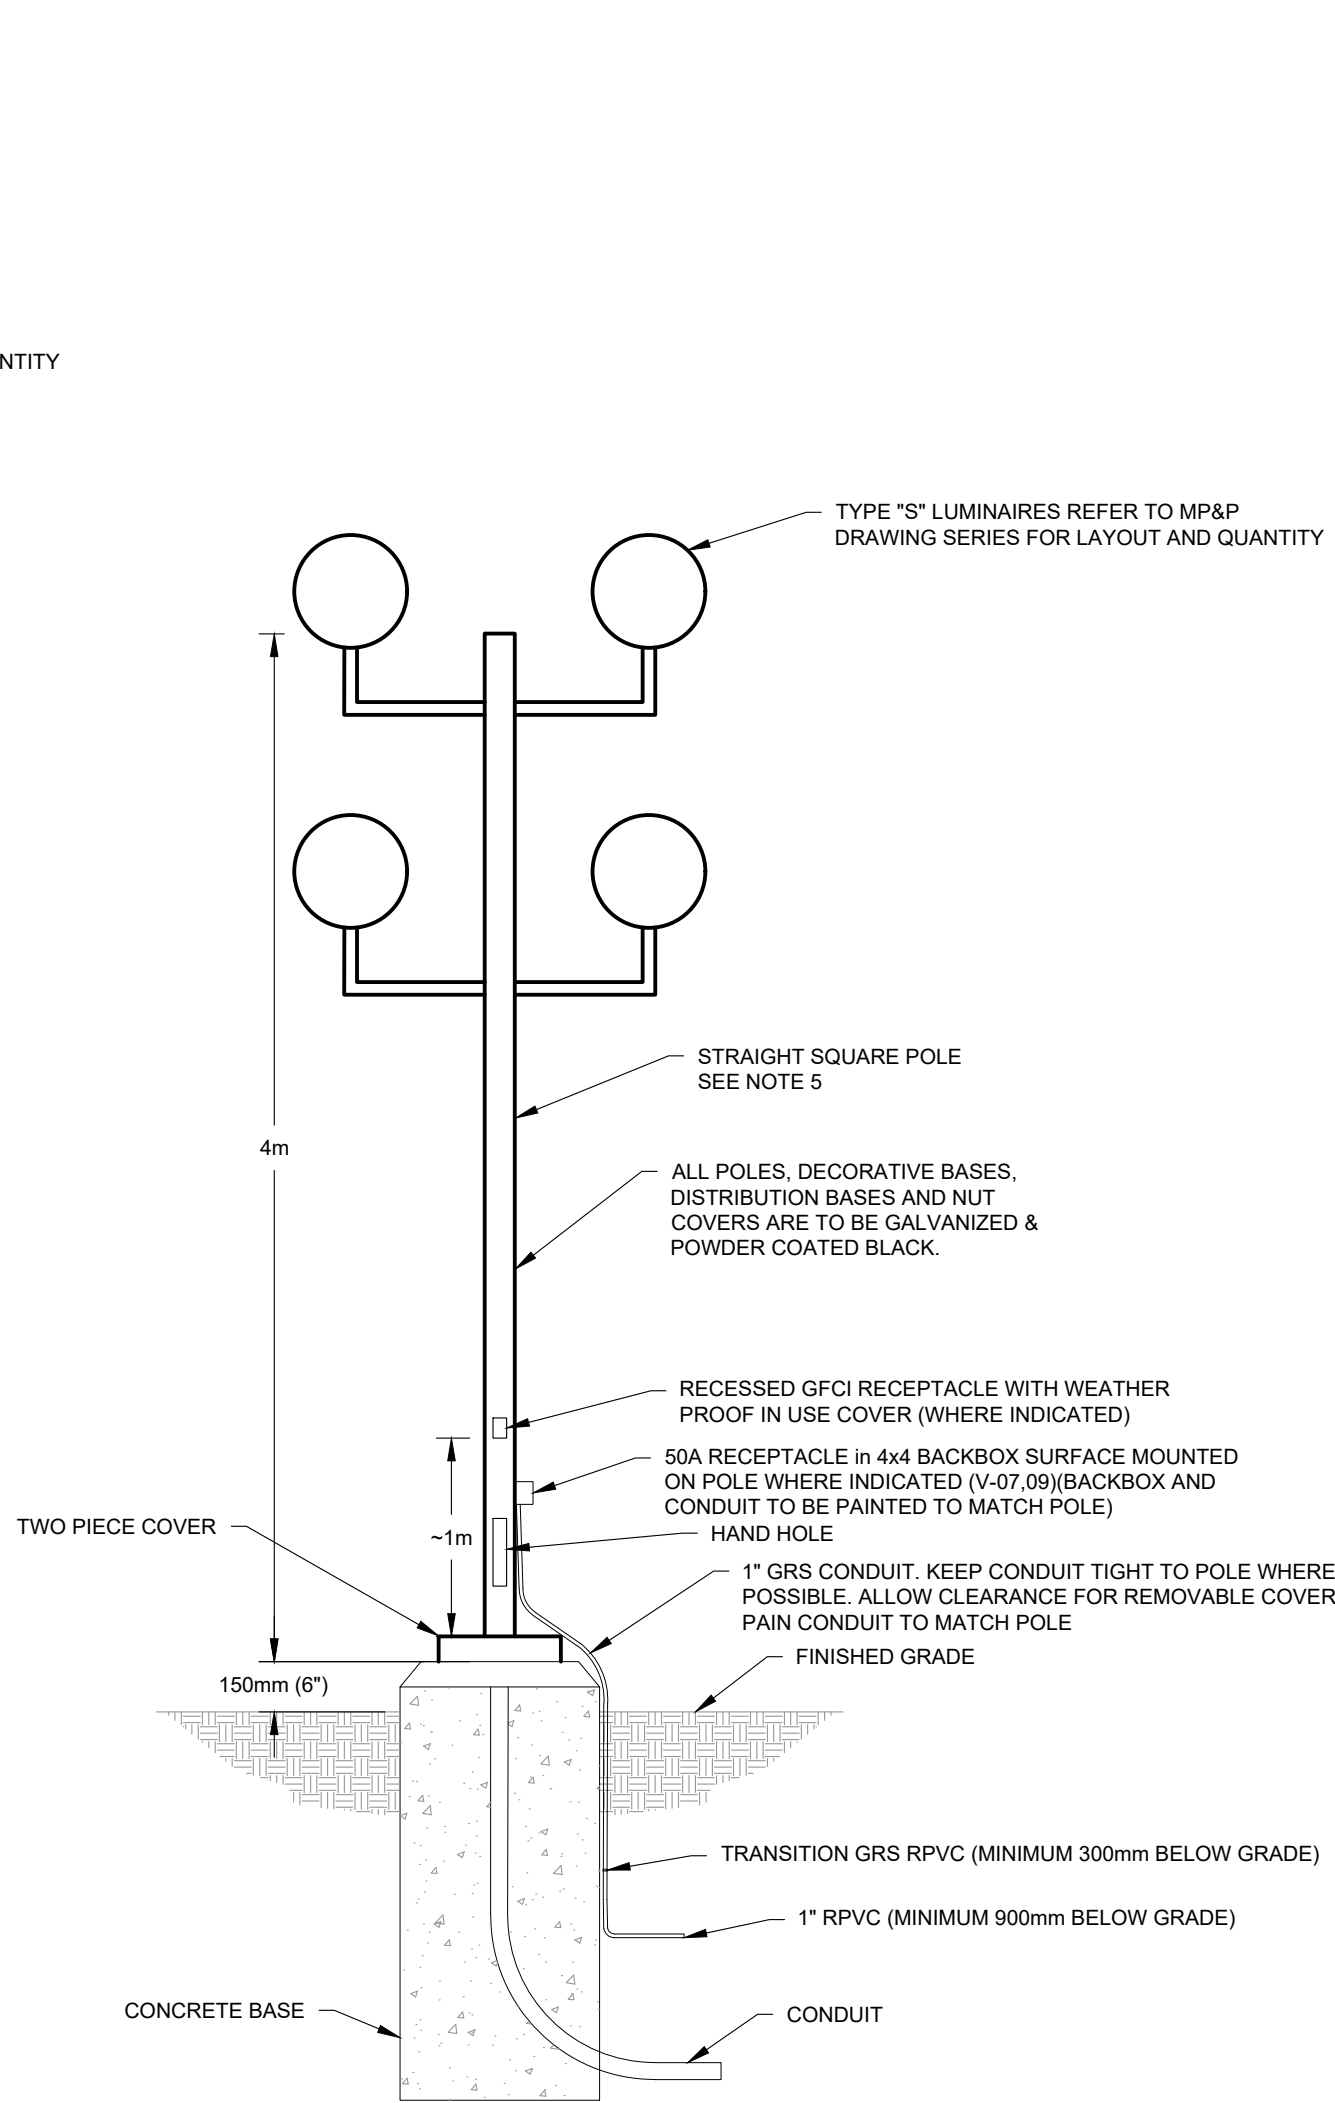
POLE LUMINAIRE FIXTURE TYPE "S1" MOUNTING DETAIL
